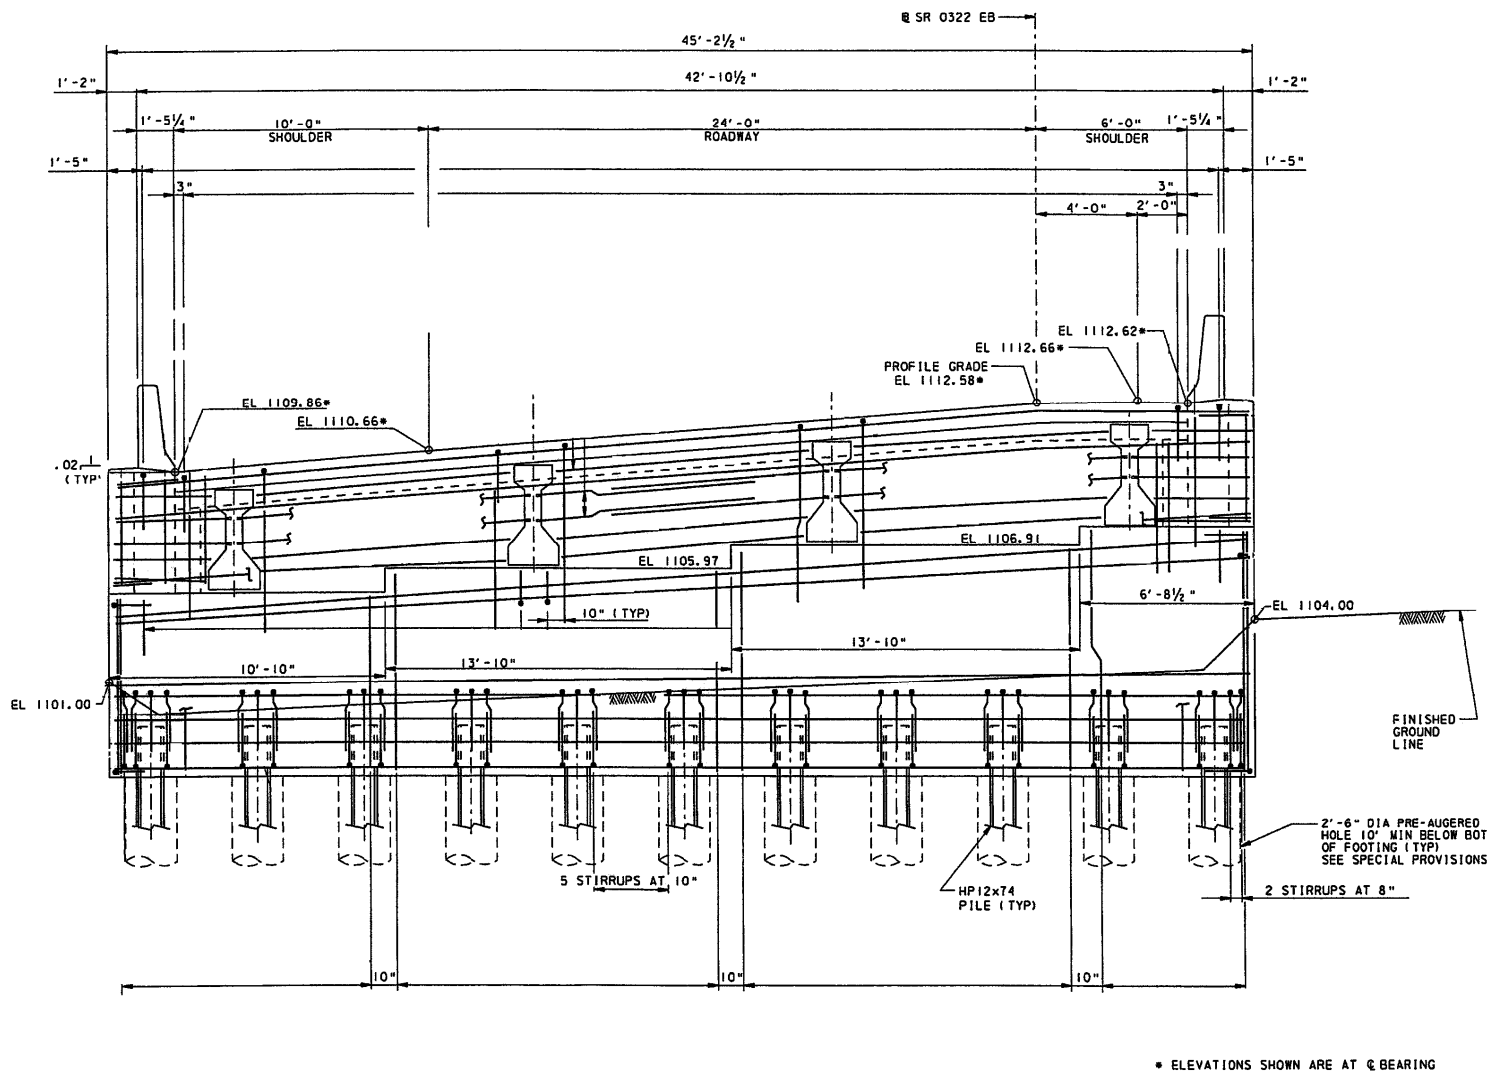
Elevation of Bridge 222 Abutment 1.
